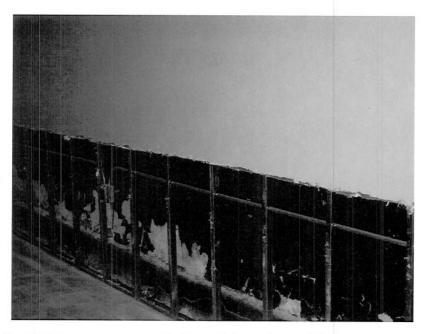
After EHSI pre-proposal walk-through but prior to this assessment, many lower GWB walls were removed to facilitate drying of wall cavities.
